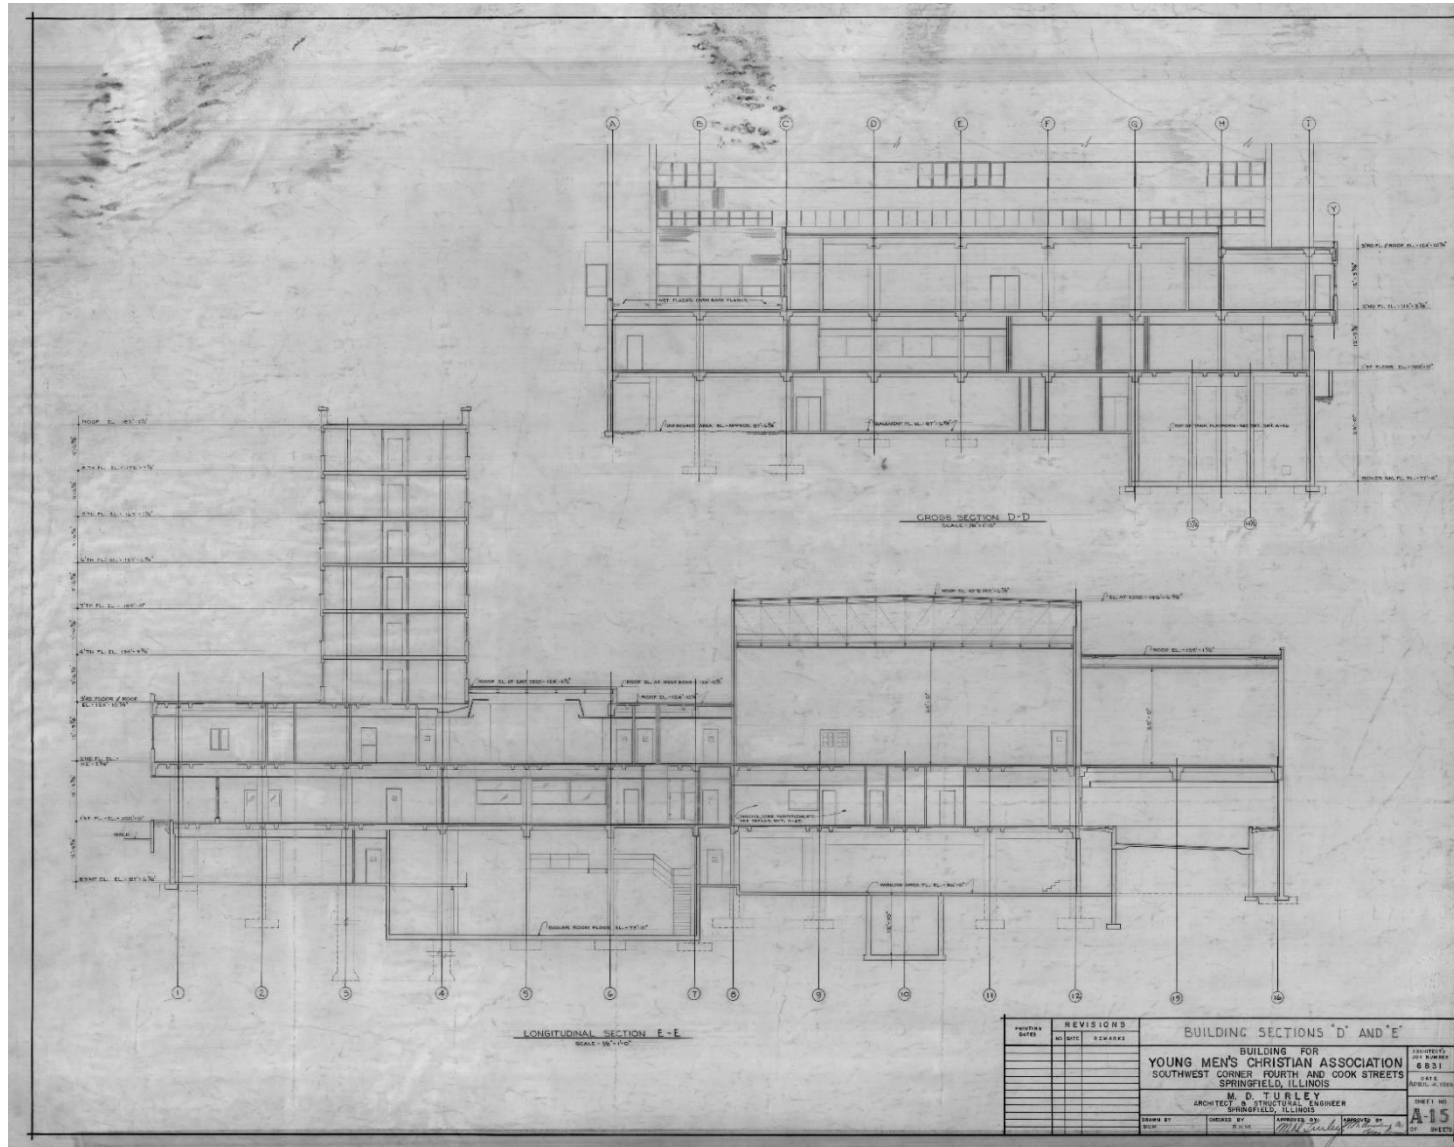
Building Sections “D” and “E” (Turley 1958; Sheet No. A-15).
